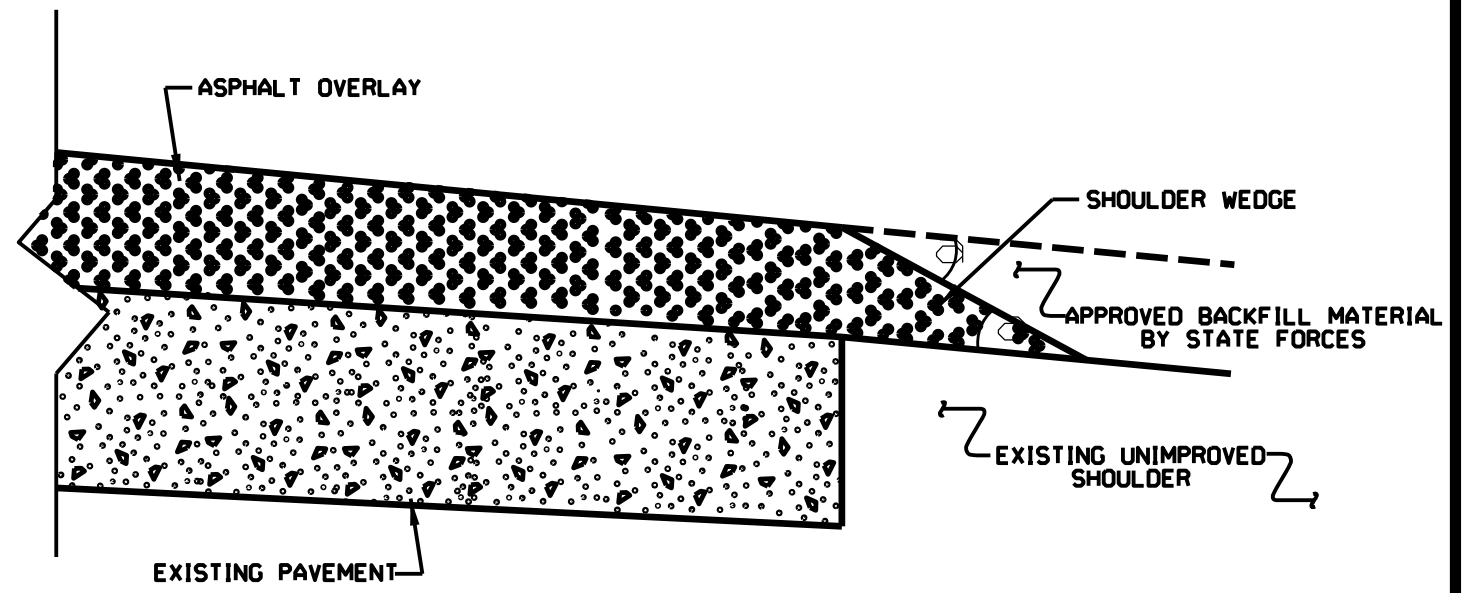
## DETAILS OF LEVELING EXISTING PAVEMENT PRIOR TO RESURFACING
